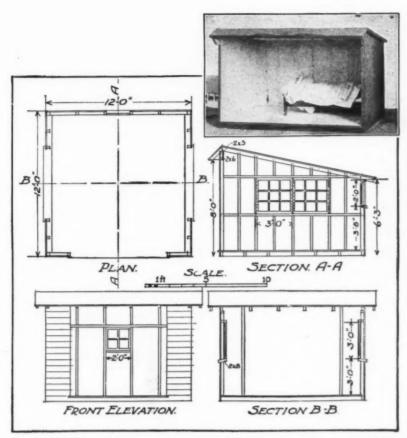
Living and sleeping in the open air. Front view, floor plan, and elevations of a shack for flat roofs.
